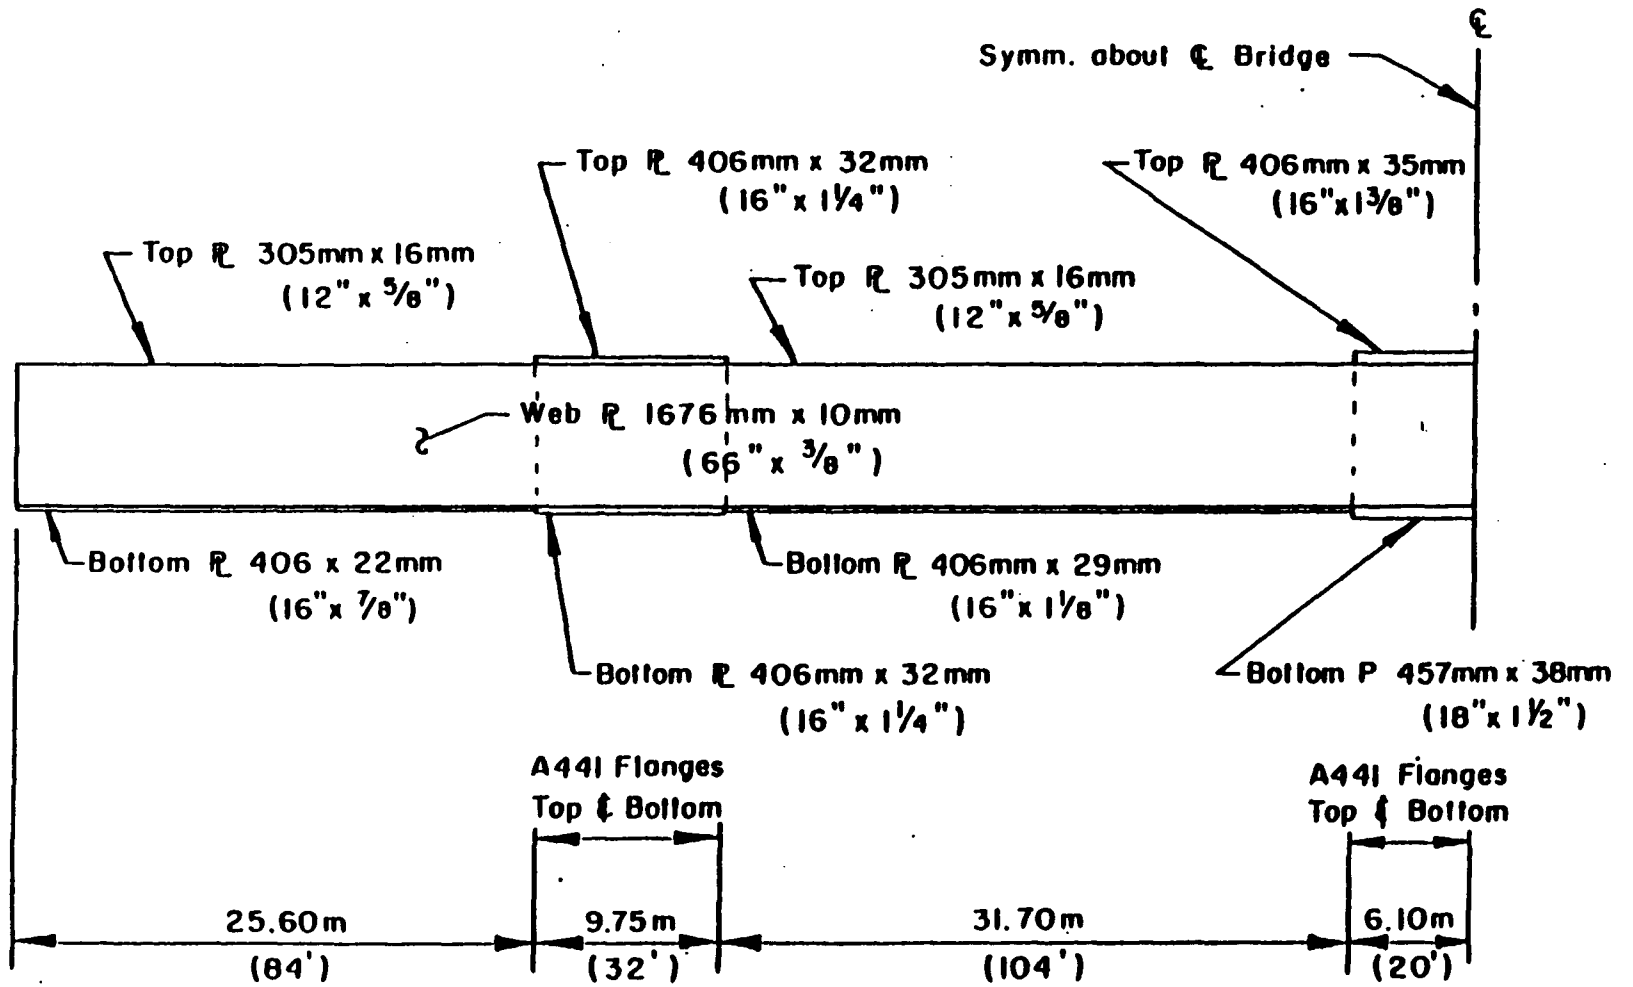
FHWA Four-Span Plate Girder - Elevation
